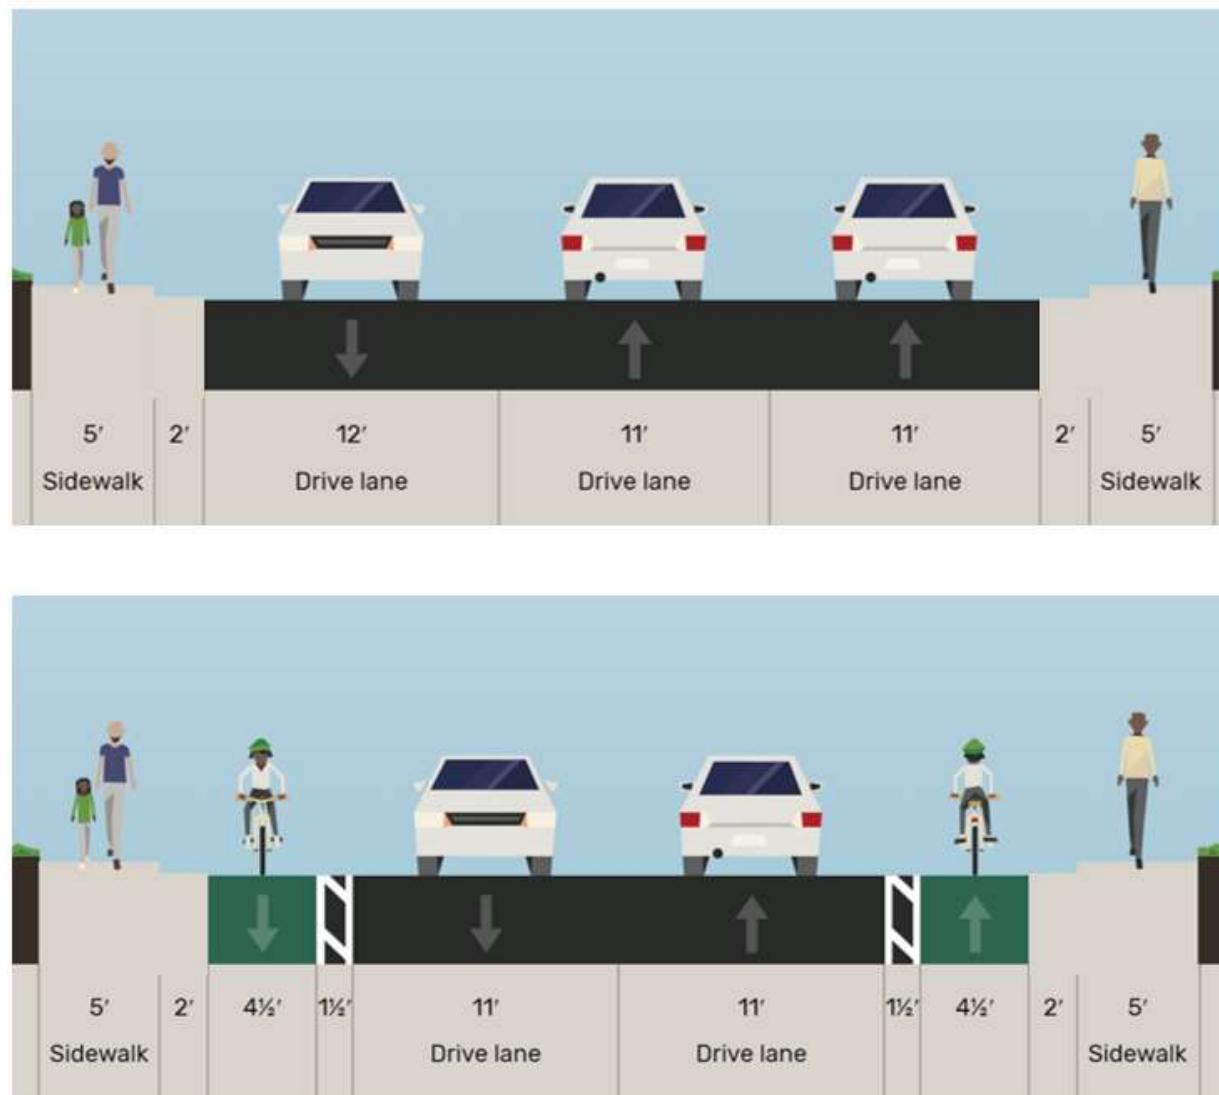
Gay Street, West of Main Street – Existing (Top) and Proposed Road Reconfiguration (Bottom)
